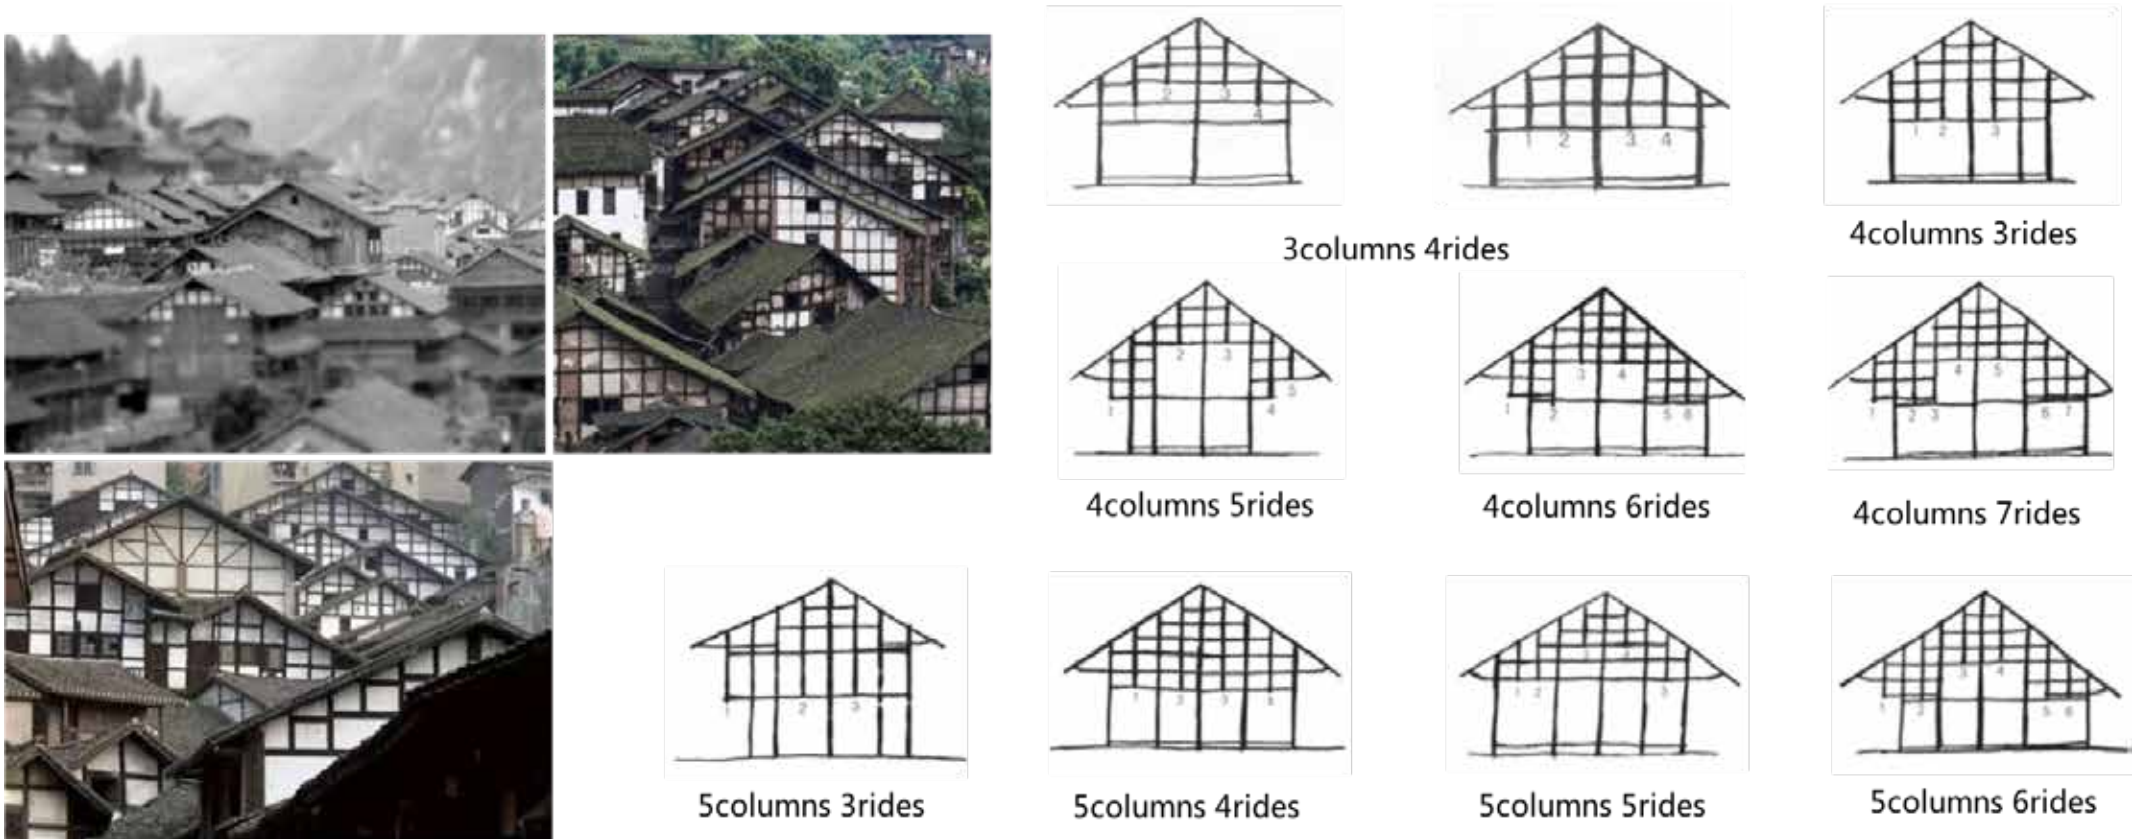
The columns and rades of Chuandou Wooden frame (source:photo and drawing by author)
